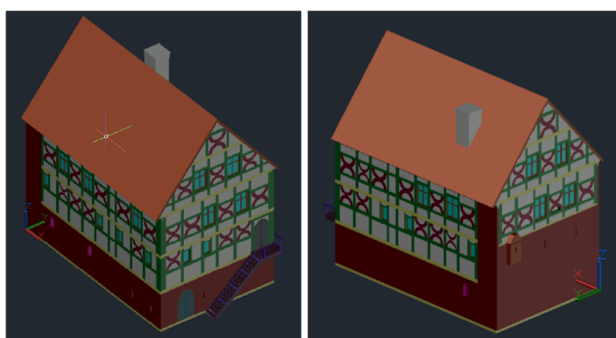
Exemplary 3D reconstructed building (front and back facade of Ganerben IV) of the Horneburg Castle.
